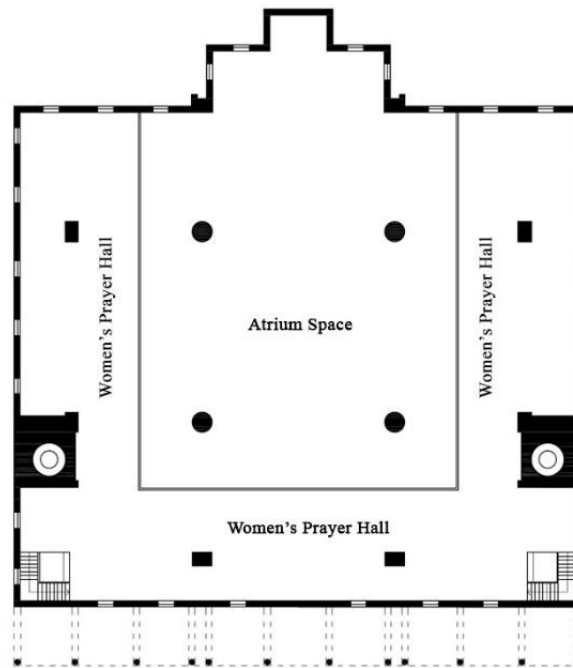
Haciveyiszade Mosque, mezzanine floor plan
